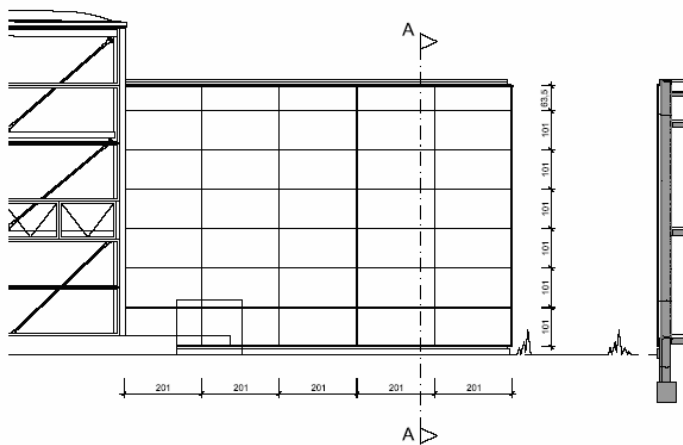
Construction drawing for VIP-sandwich-elements on a testing building (gable)
